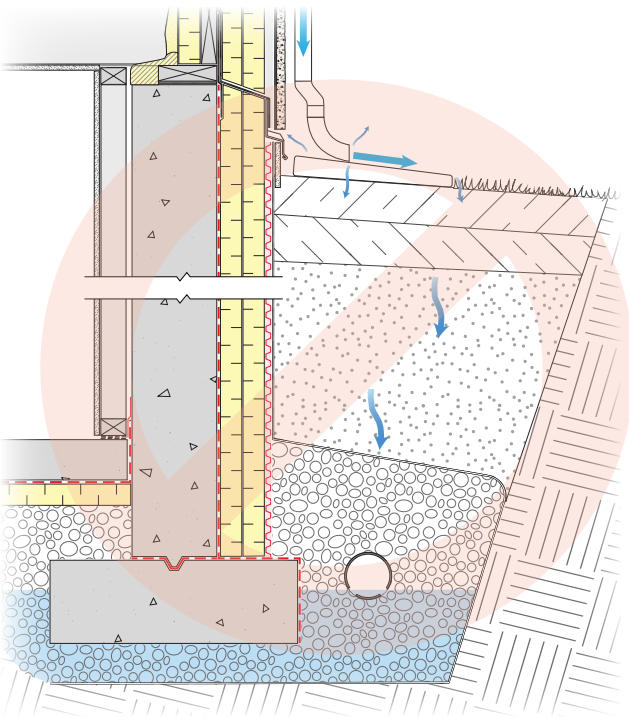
Schematic of a poor single pipe drainage system. The downspout discharges to a splash pad, which can direct water towards the building foundation wall. Refer to Figure 8.2 for best practice.
